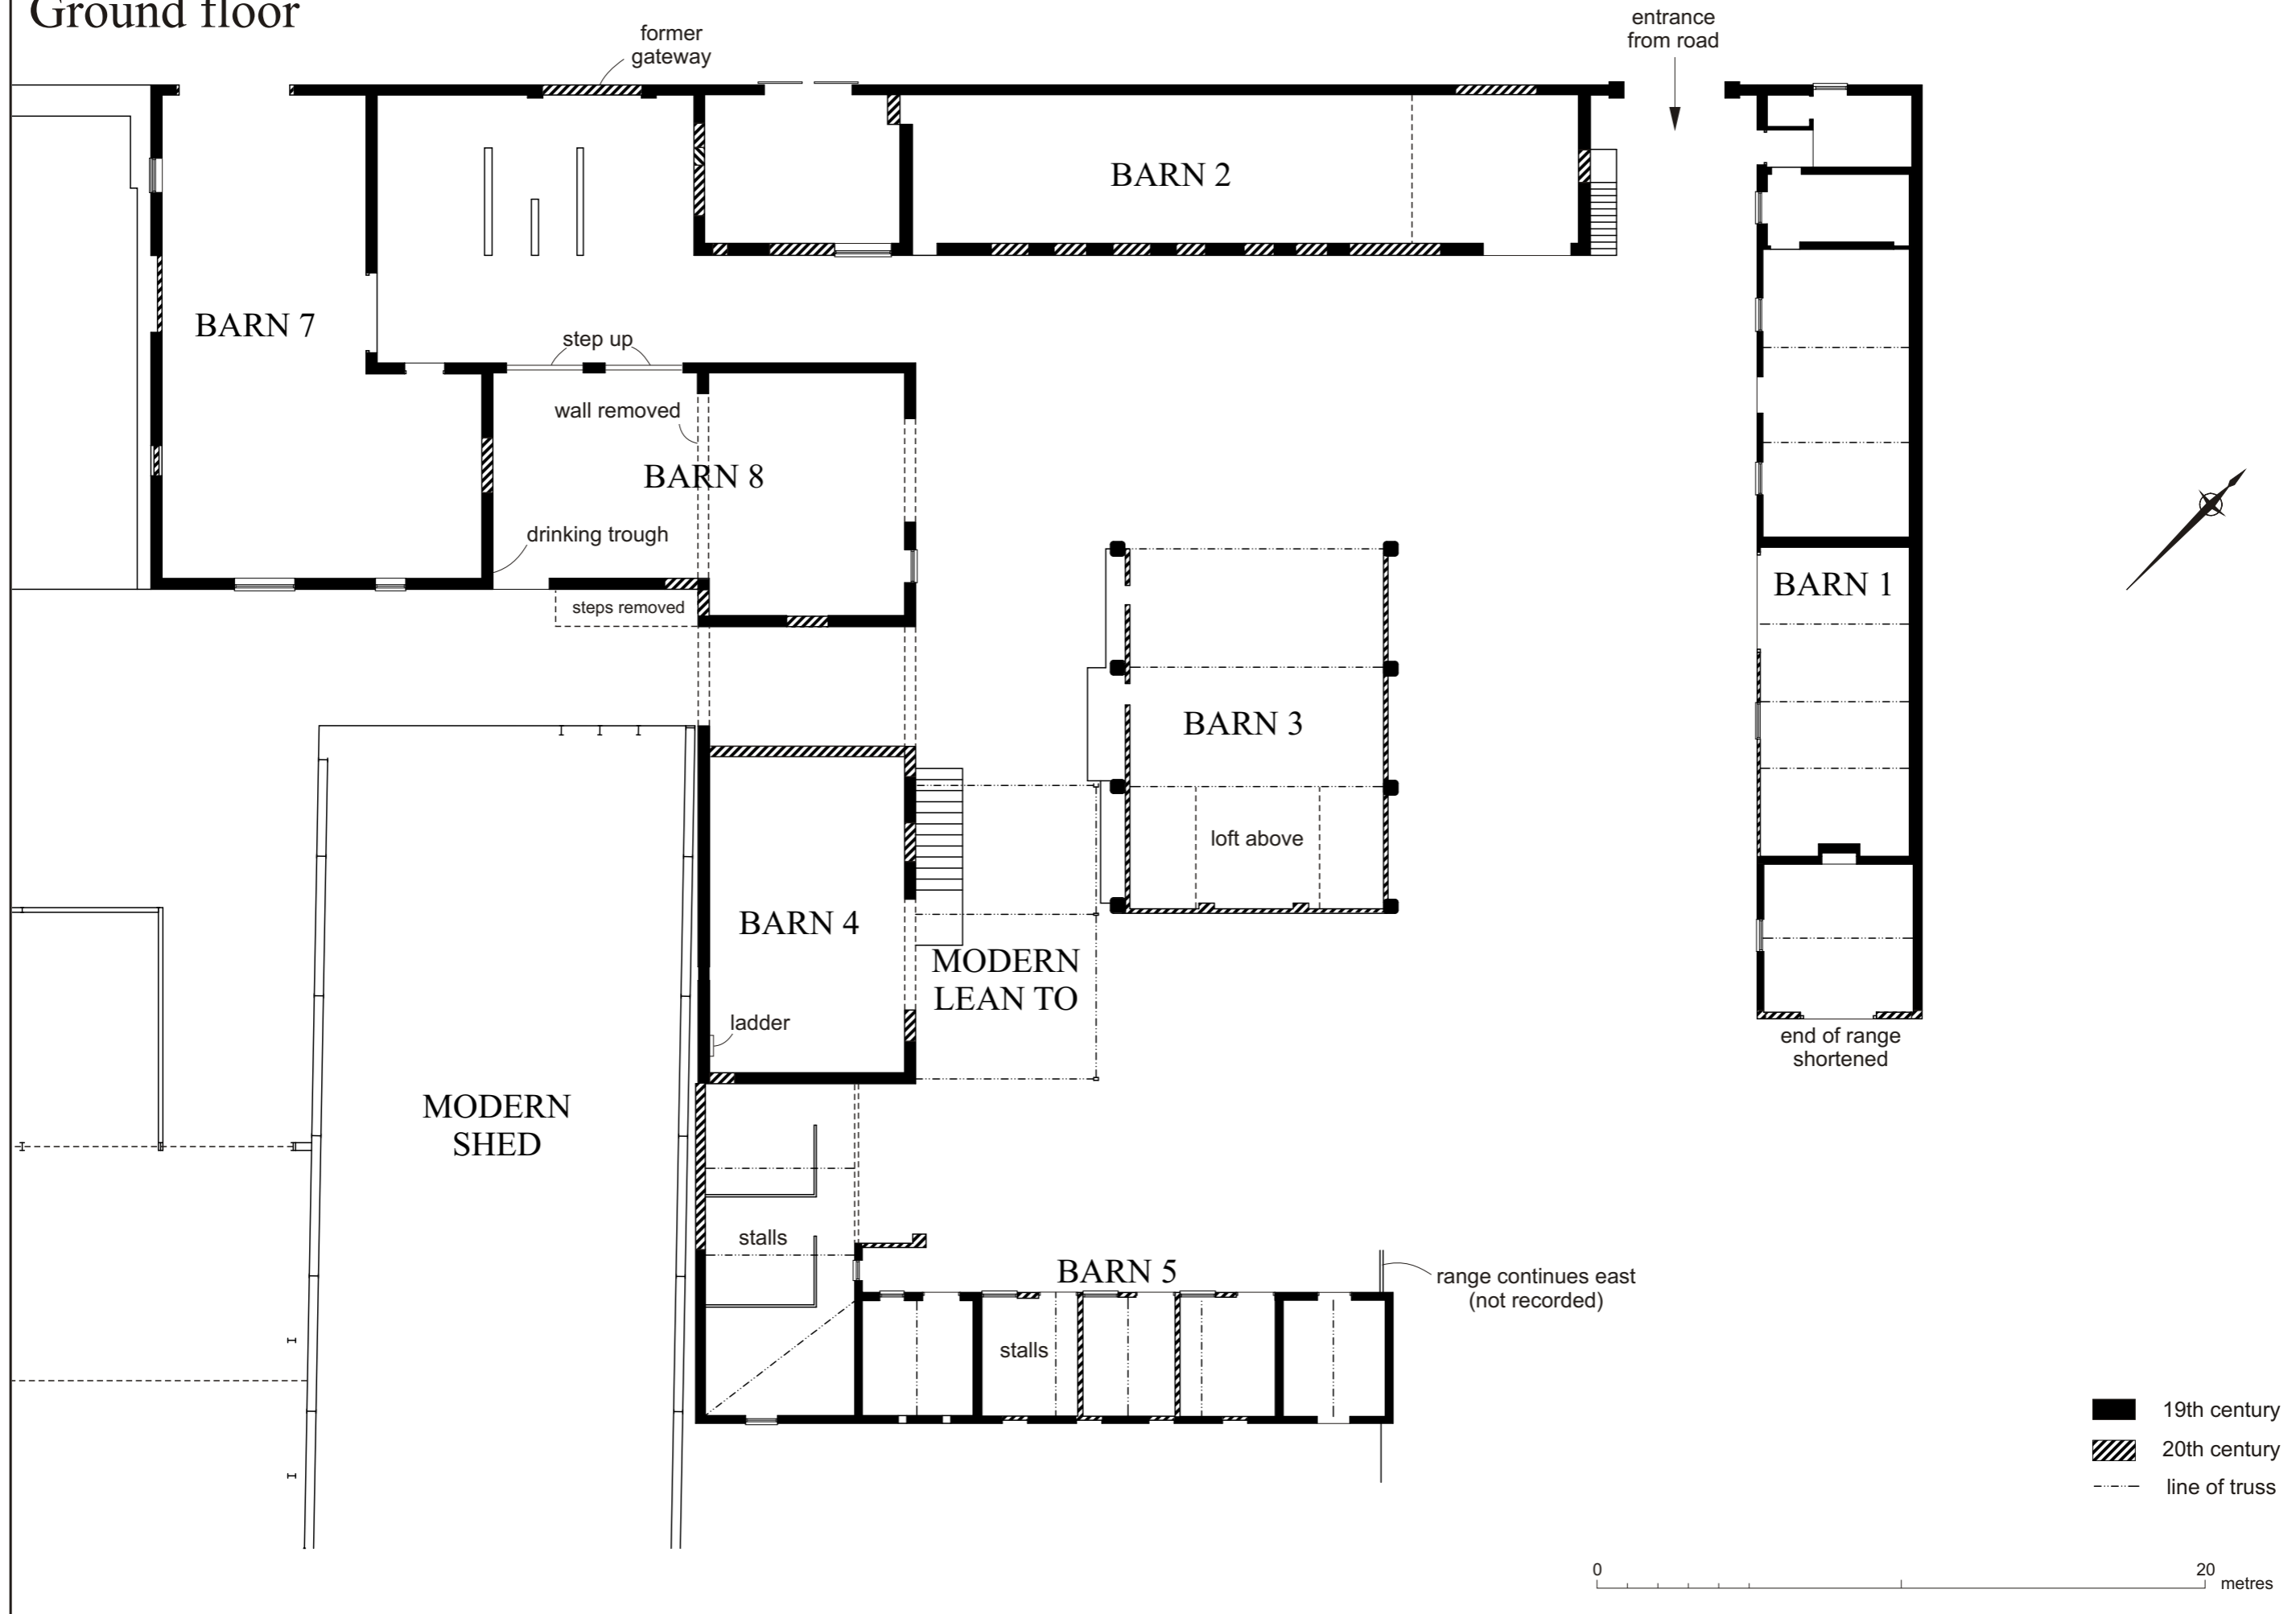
Ground plan of farmyard buildings (based on ARA architect's plan 5812-20).
